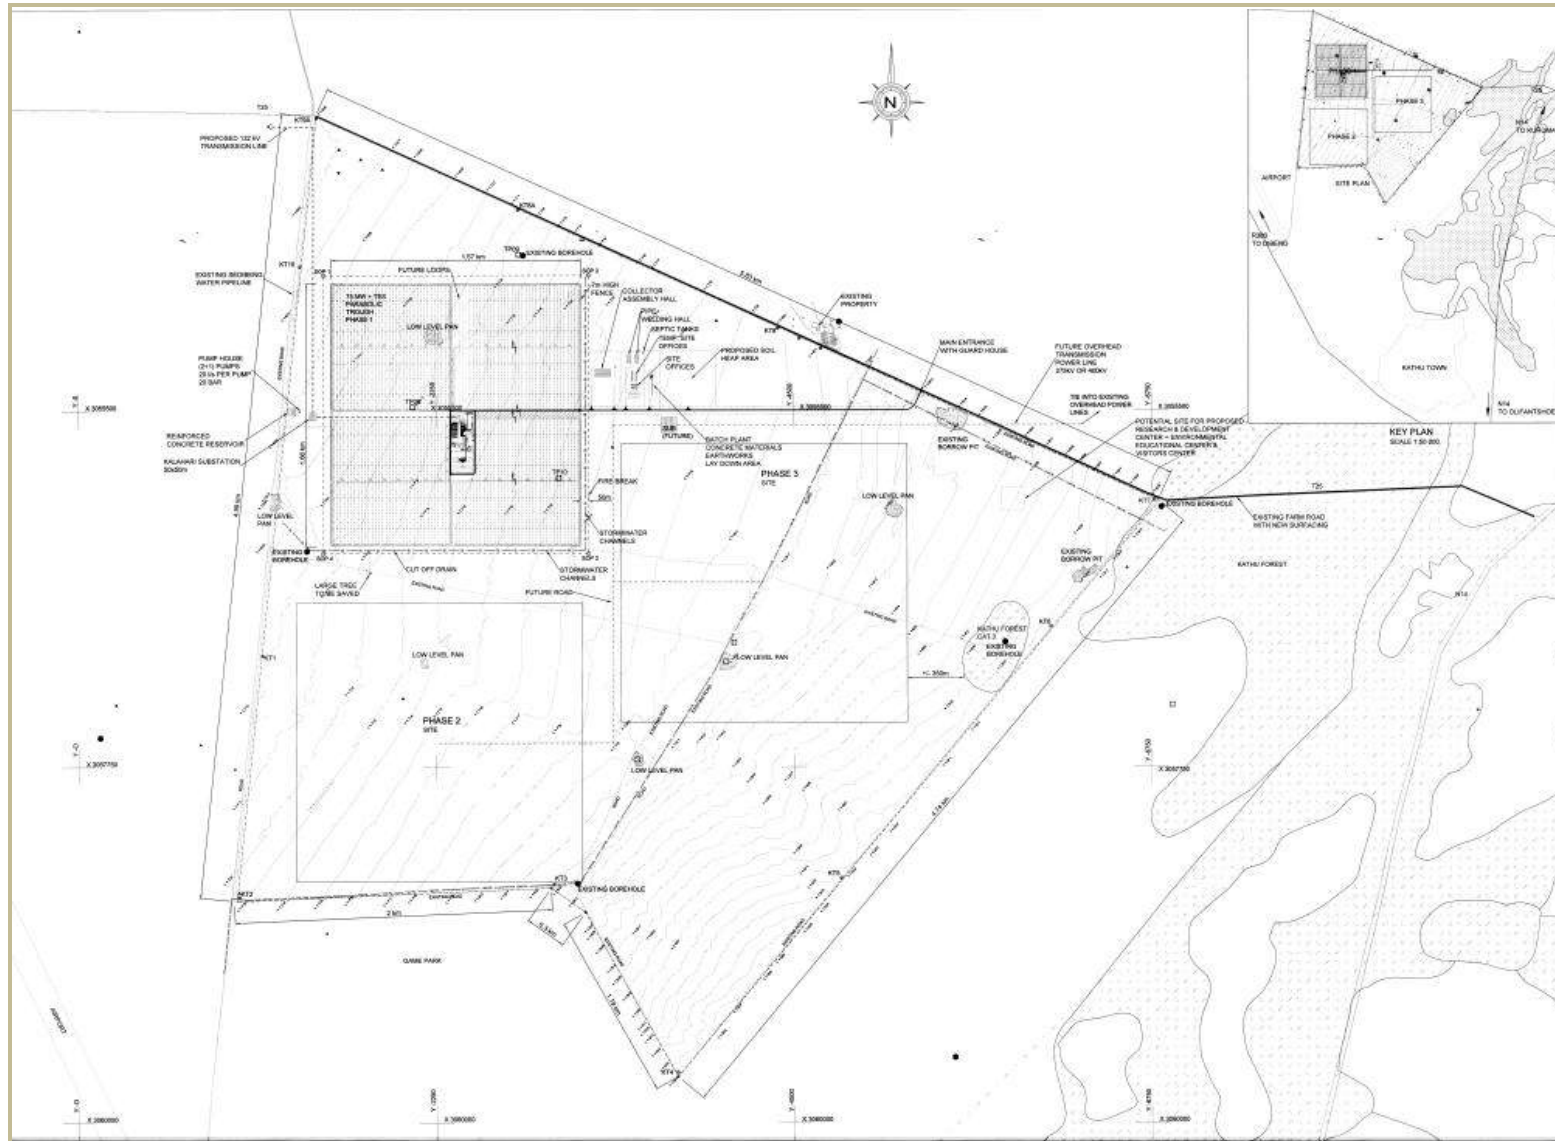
Layout plan indicating contours (Group Five, 2011)
